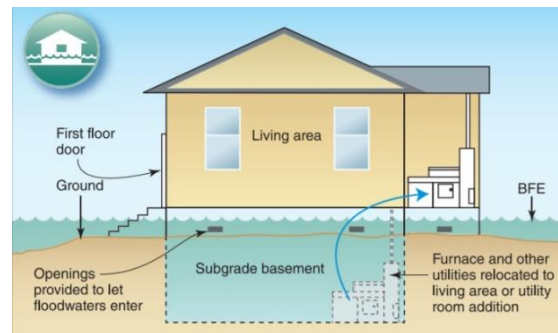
Wet floodproofing schematic (FEMA, 2014)
